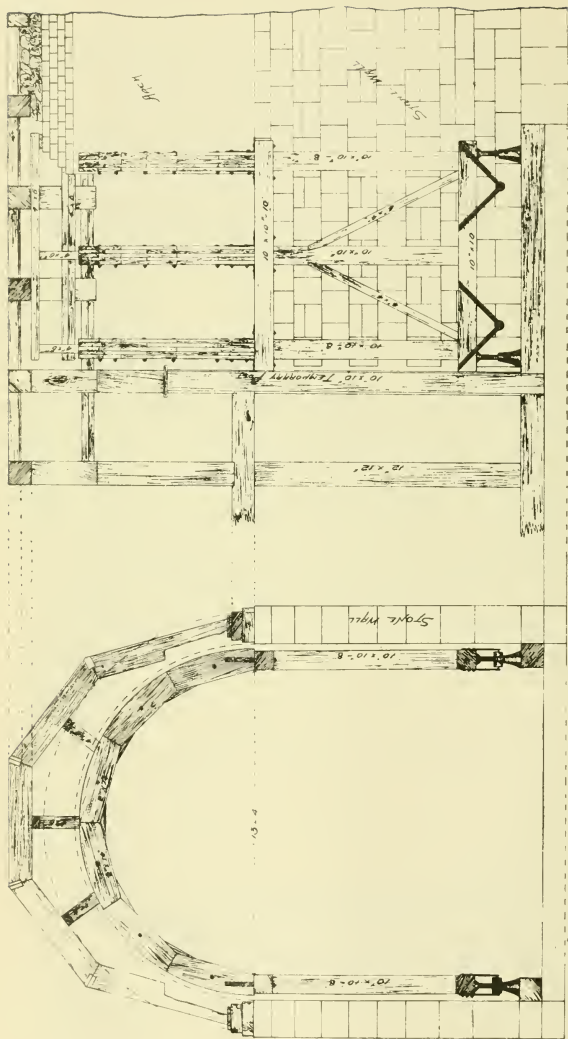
PLATE III.—Details of Centering and Removal of Necessary Arch Timbers.
